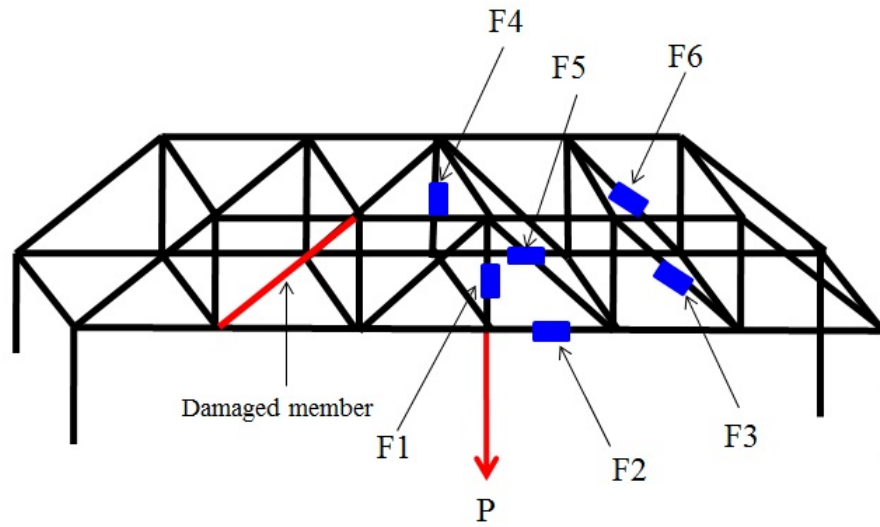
Schematic of loaded damage truss bridge
